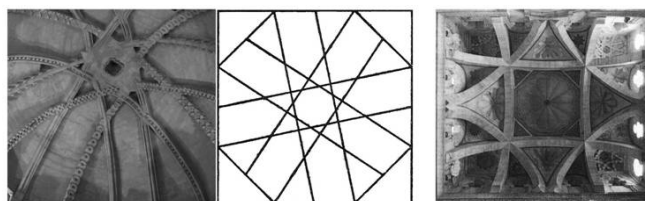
Chapel of Talavera: Photo and plan layout (left) Chapel of Villaviciosa
